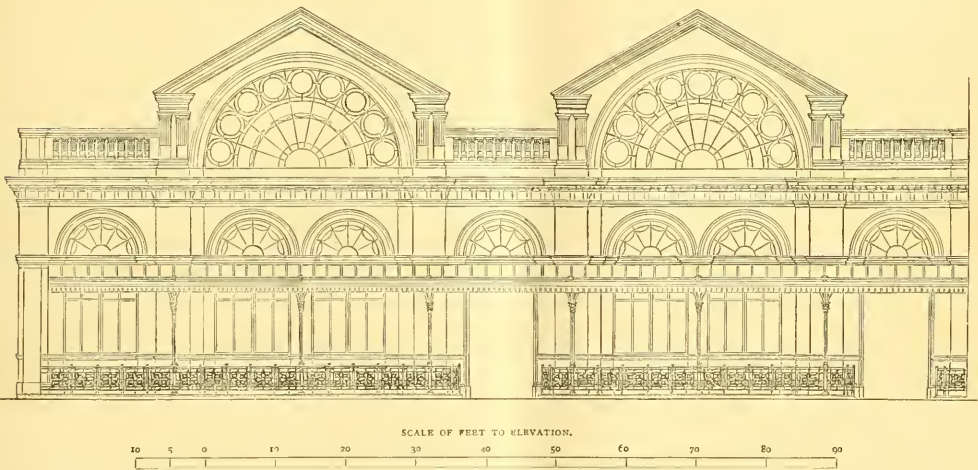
NEW FLOWER MARKET, COVENT GARDEN: ELEVATION NEXT TAVISTOCK STREET.
